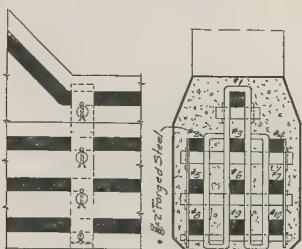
DETAIL SHOWING SPACER TO HOLD STEEL BARS IN POSITION IN THE 80-FT. GIRDER.
